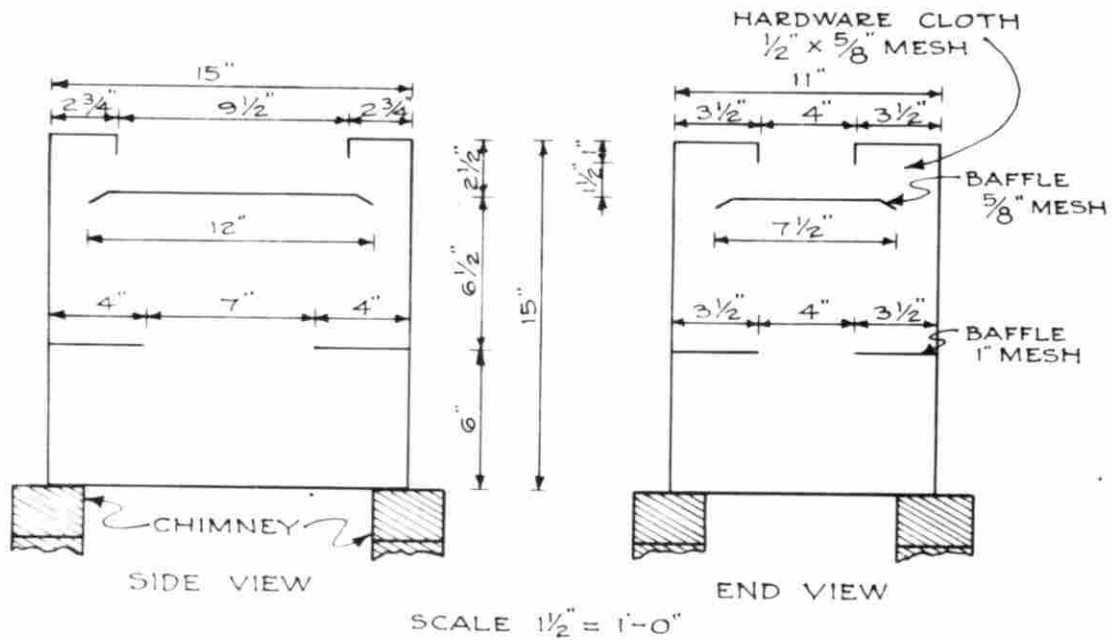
SECTIONAL SKETCH OF NO. 7 SPARK ARRESTER
